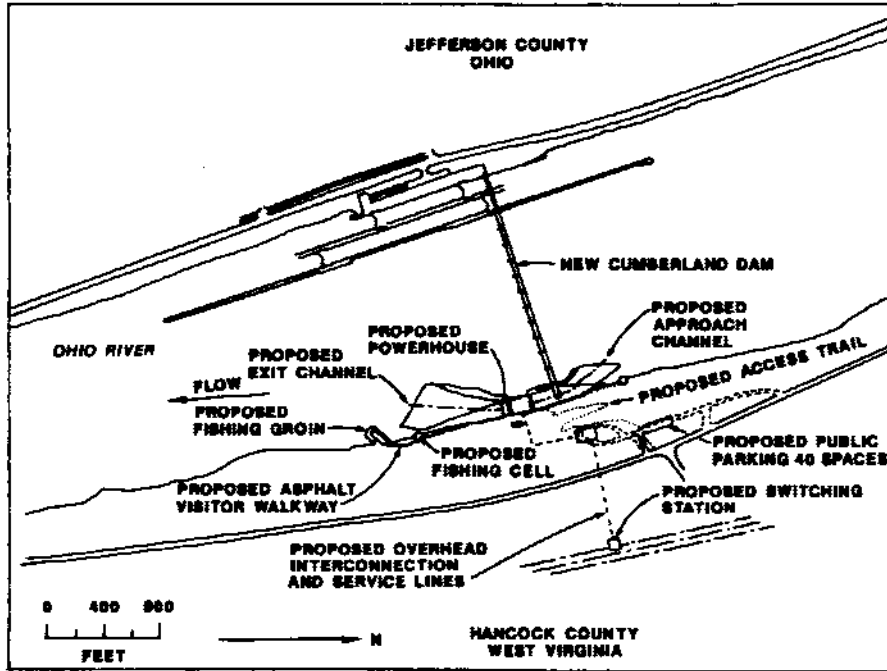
Layout diagram for the New Cumberland Lock and Dam Project (FERC No. 6901). Source: Modified from Exhibit E, Figure 3, City of New Martinsville, 1985.
